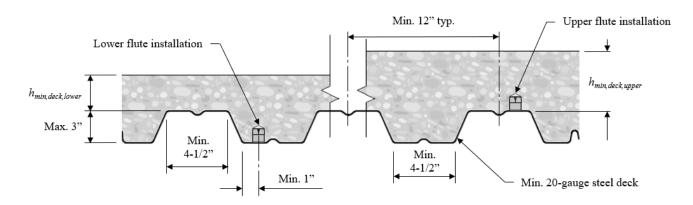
A - HDI-P TZ AND HDI-TZ IN THE SOFFIT OF CONCRETE FILLED PROFILE STEEL DECK ASSEMBLIES - W DECK
